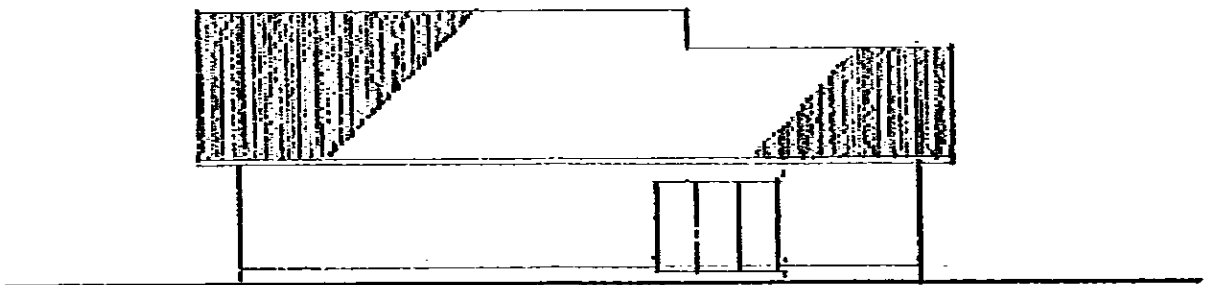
Floor Plan and General Drawings of Crop Protection Brigade
